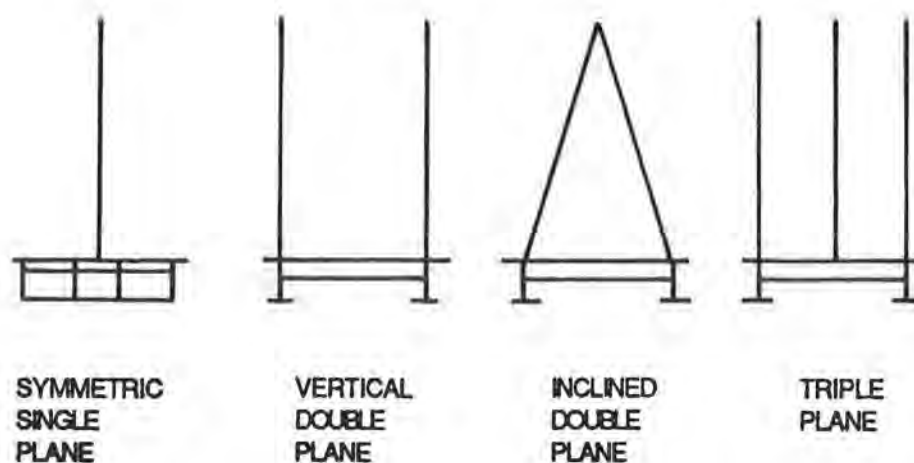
Typical transverse arrangements for bridge stays [7]
